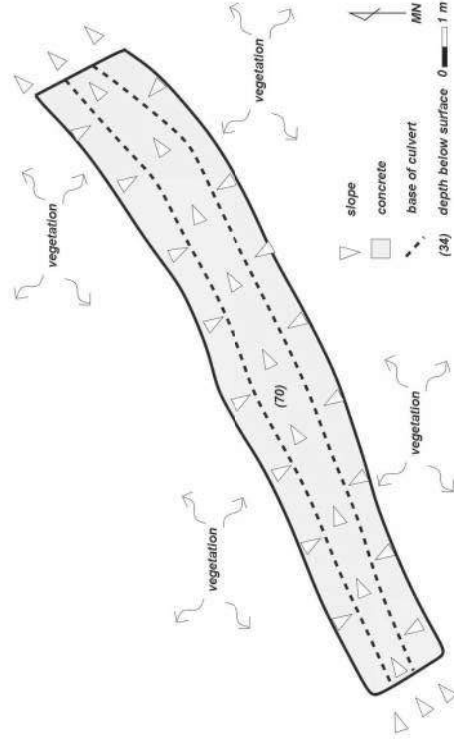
Feature 08920c 'Auwai 1, plan view drawing of concrete culvert.
